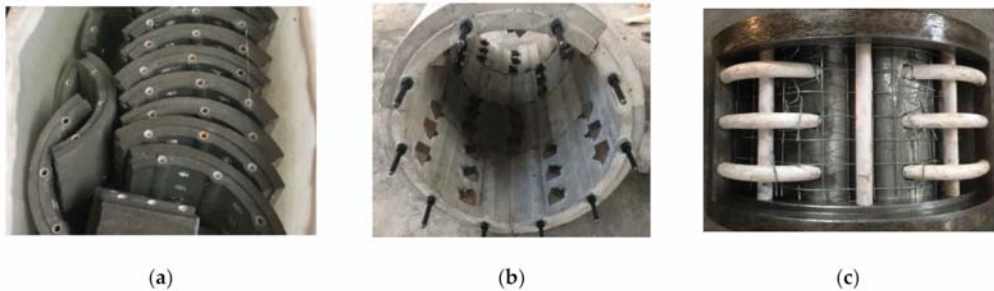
The LCSS and mold. (a) Segments; (b) Sleeve; (c) Mold of segments.
